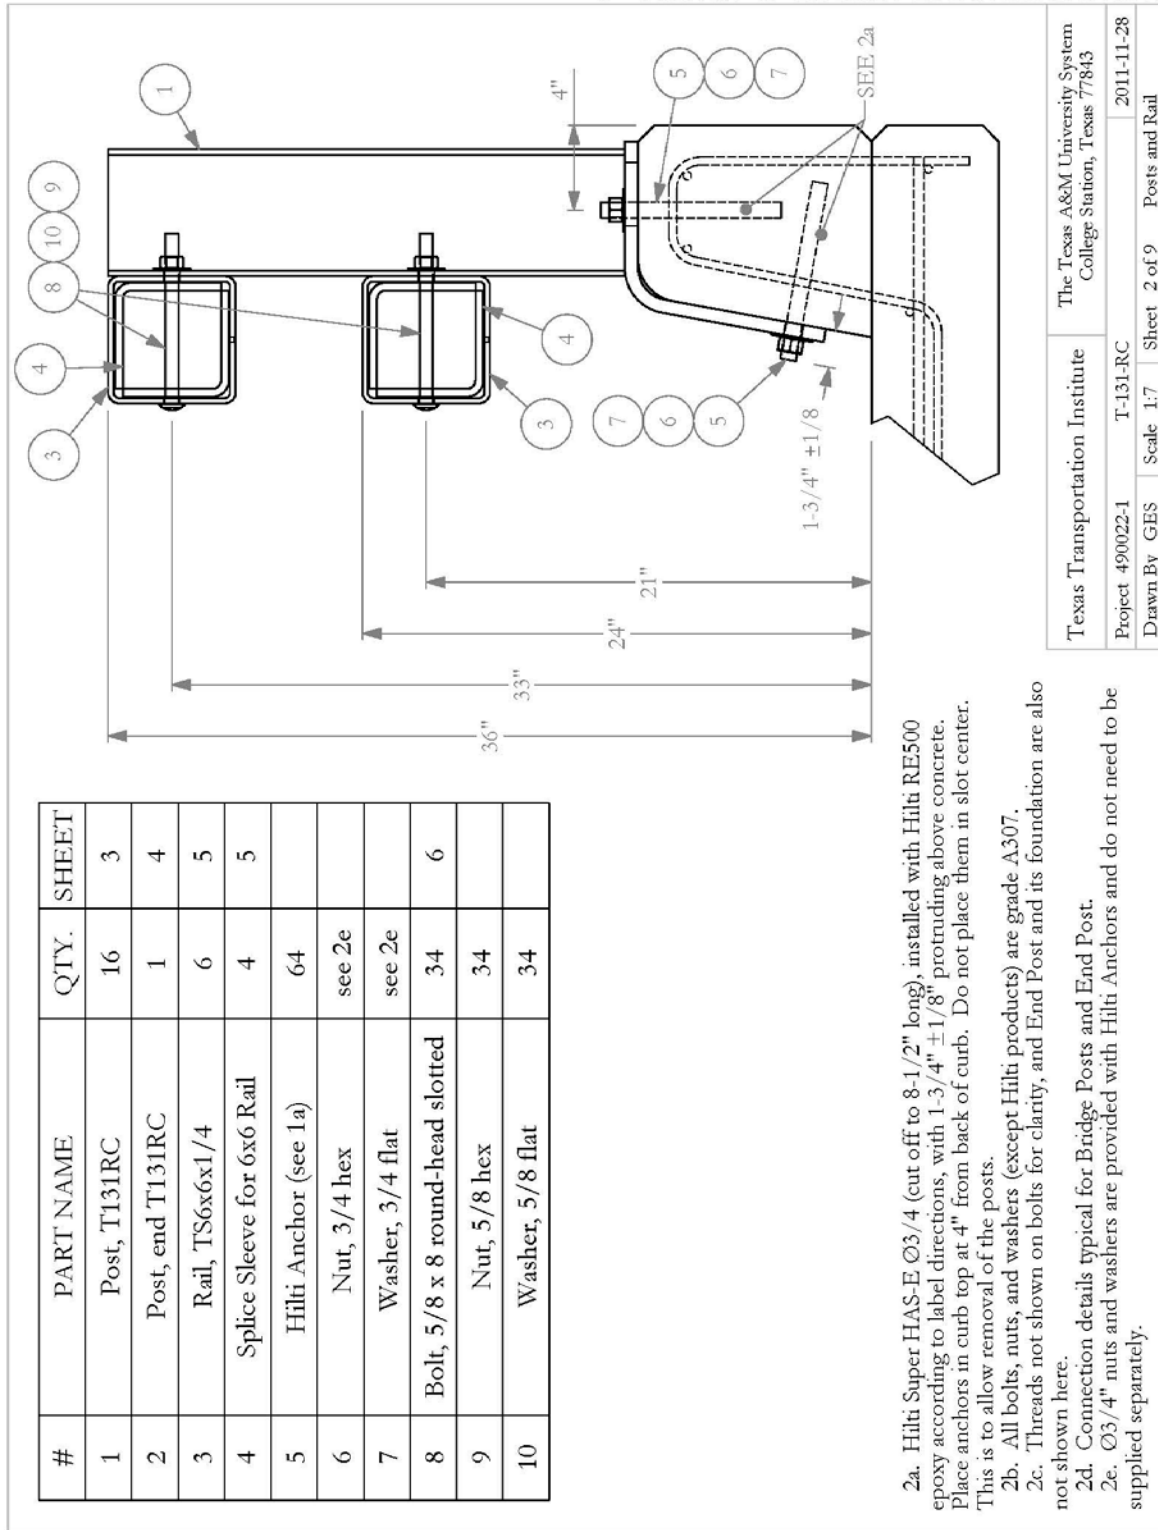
Details of the T131RC Bridge Rail Installation.
